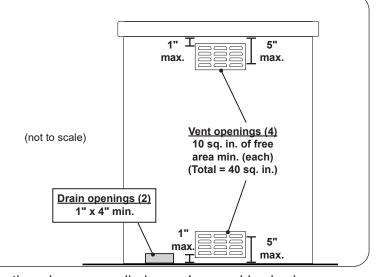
Ventilation and drainage specifications (propane cylinder enclosure side view)
